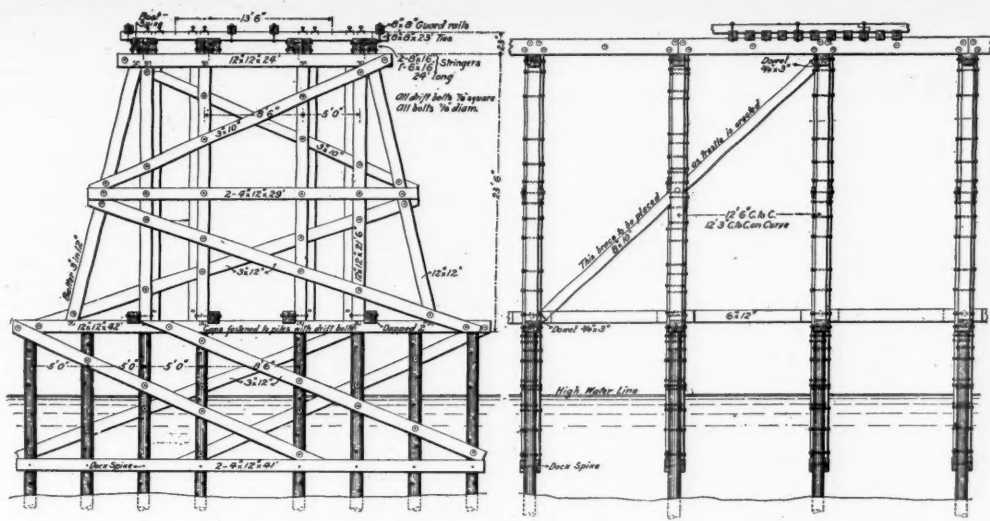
Cross-Section and Part Side Elevation of Temporary Trestle.
